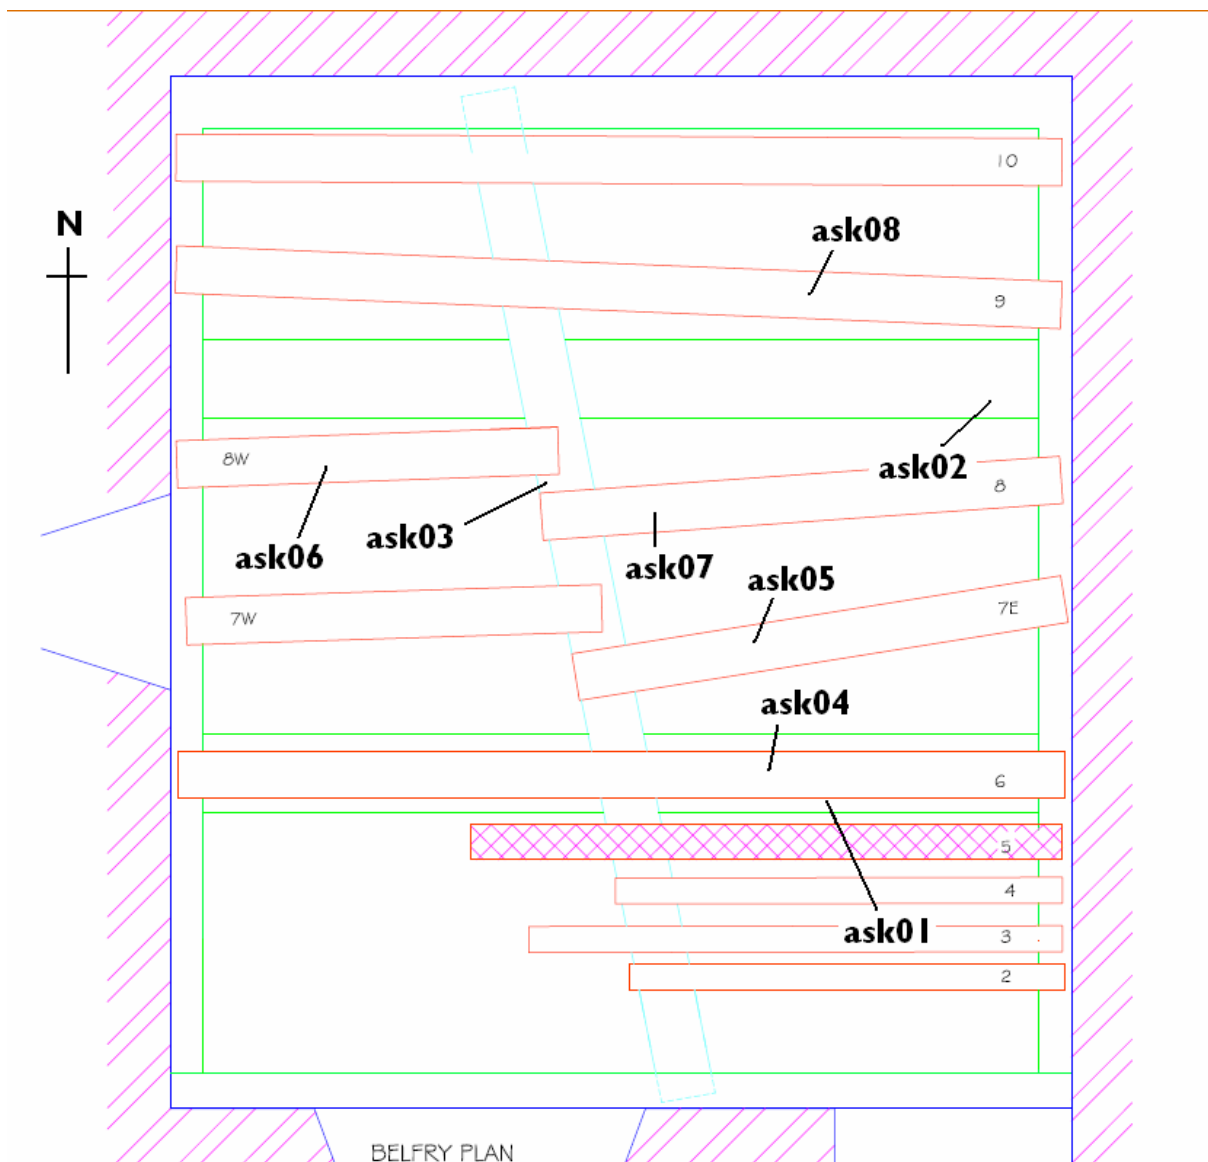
Plan of the belfry floor, showing the timbers sampled.
